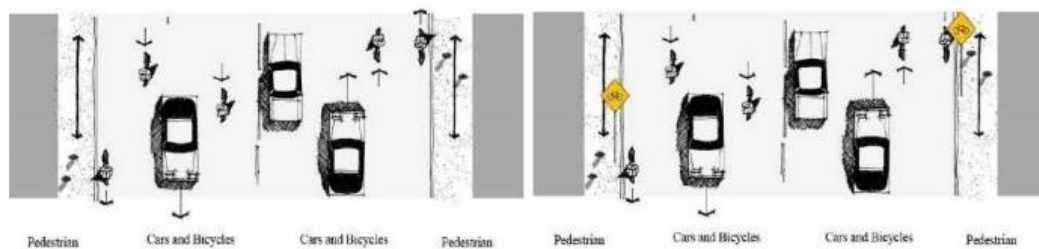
To the left plan sketch for the shared roadway; to the right plan sketch for the signed shared roadway
